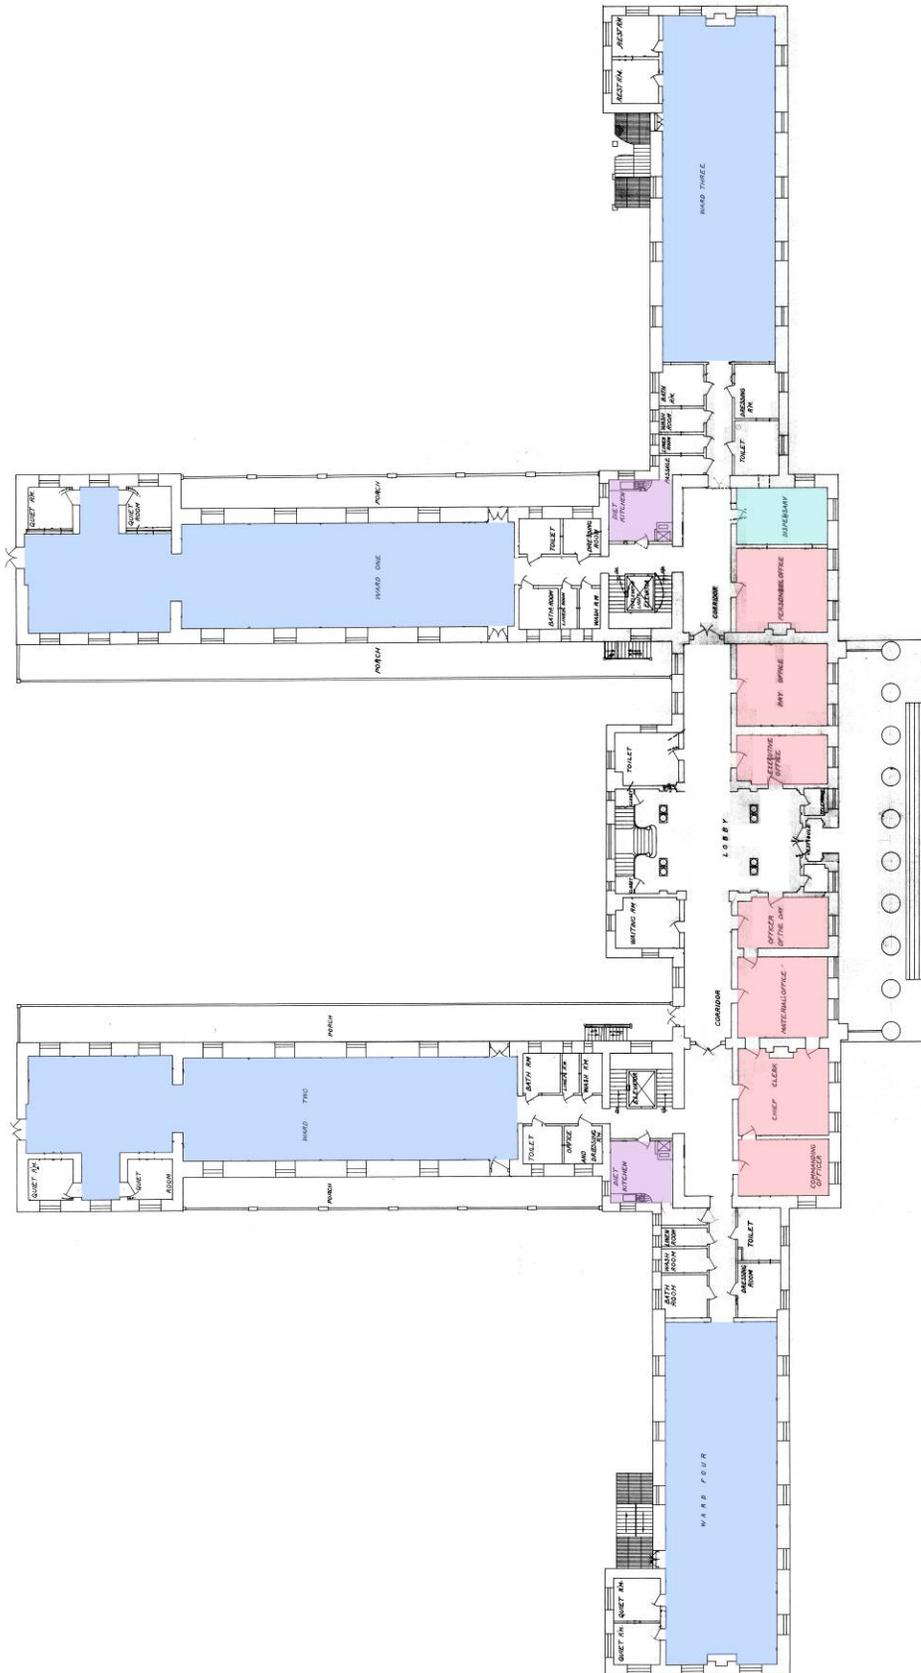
First floor plan of Naval Hospital Portsmouth, Virginia, circa 1927 (NARA College Park, RG 71-551-31).
